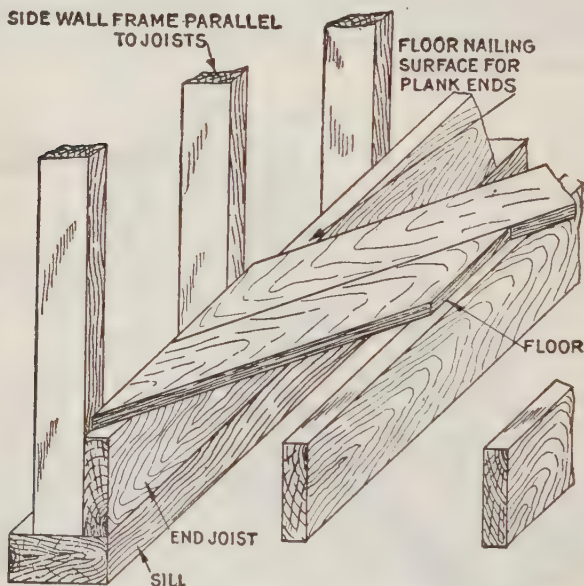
,833.—End joist nailed against studs to provide nailing surface for the ends of the floor planks.
